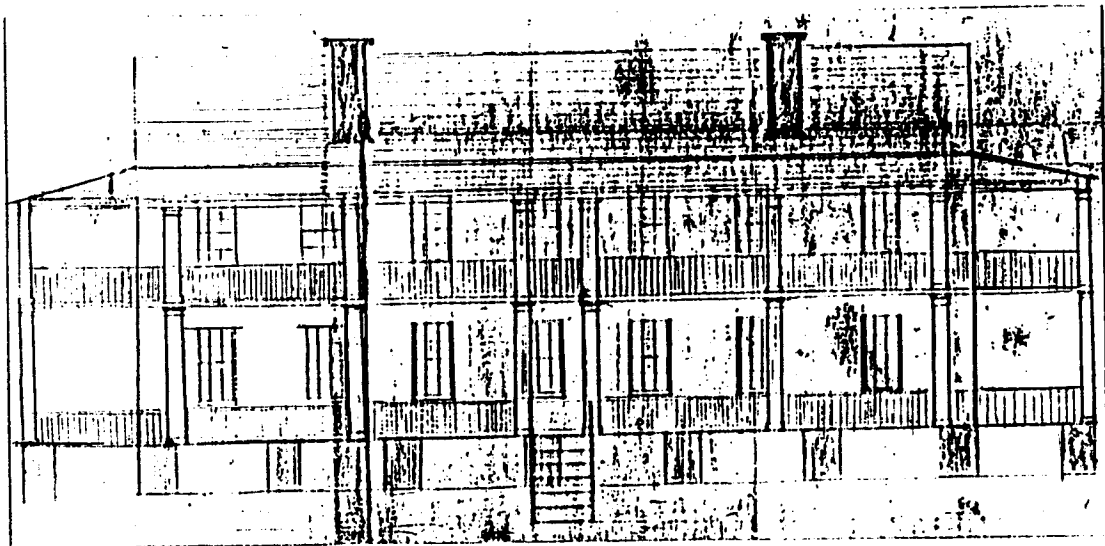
Side elevation of plan in figure 2. Note the substantial piers supporting the structure, which protected the lower floor from sea water (a frequent visitor to buildings on the island during storms) as well as the columned "piazzas" (porches).
